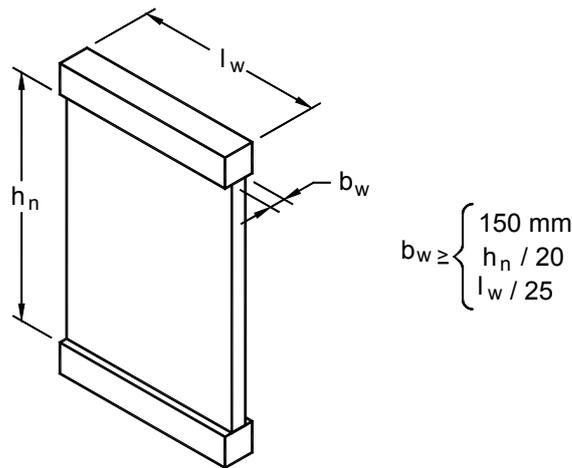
Minimum cross-section dimensions for rectangular structural concrete walls
